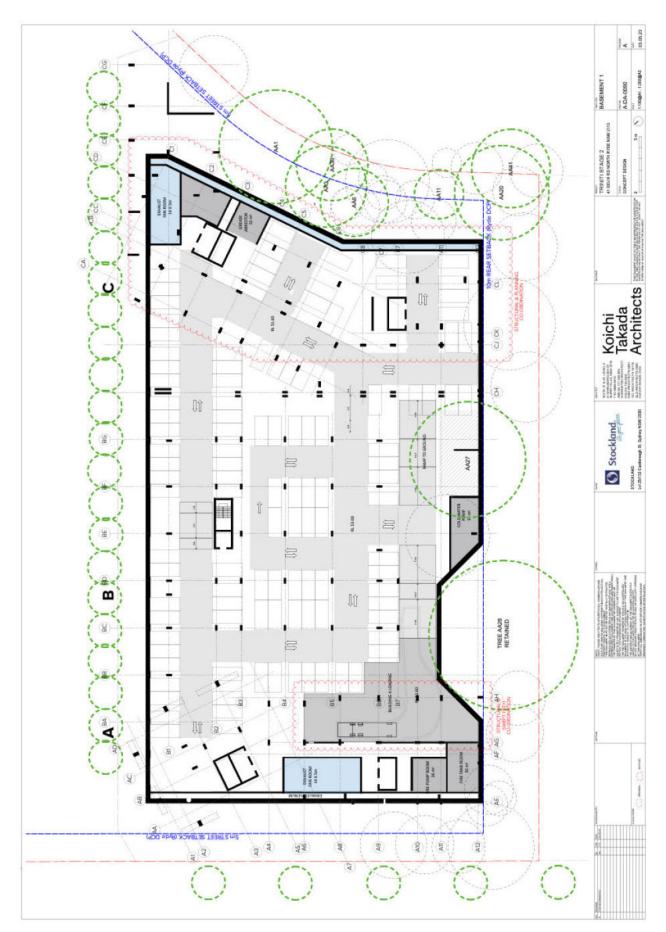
Plan of basement level of proposed development Source: Koichi Takada Architects
